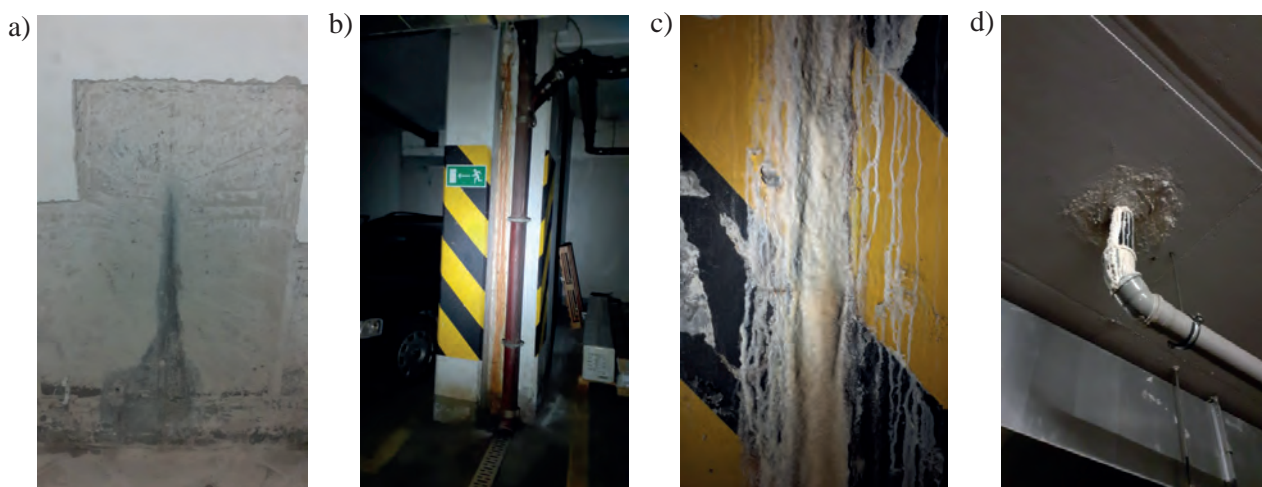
Leaks through external walls (a), expansion joints (b, c) or installation penetration points (d)
